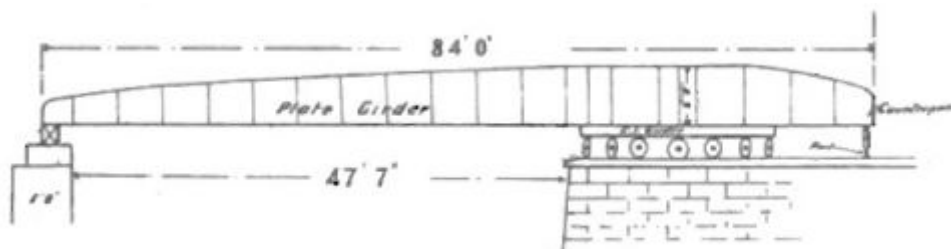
Gladesville Swing Bridge built 1881 (Source: RMS photographic archives)
